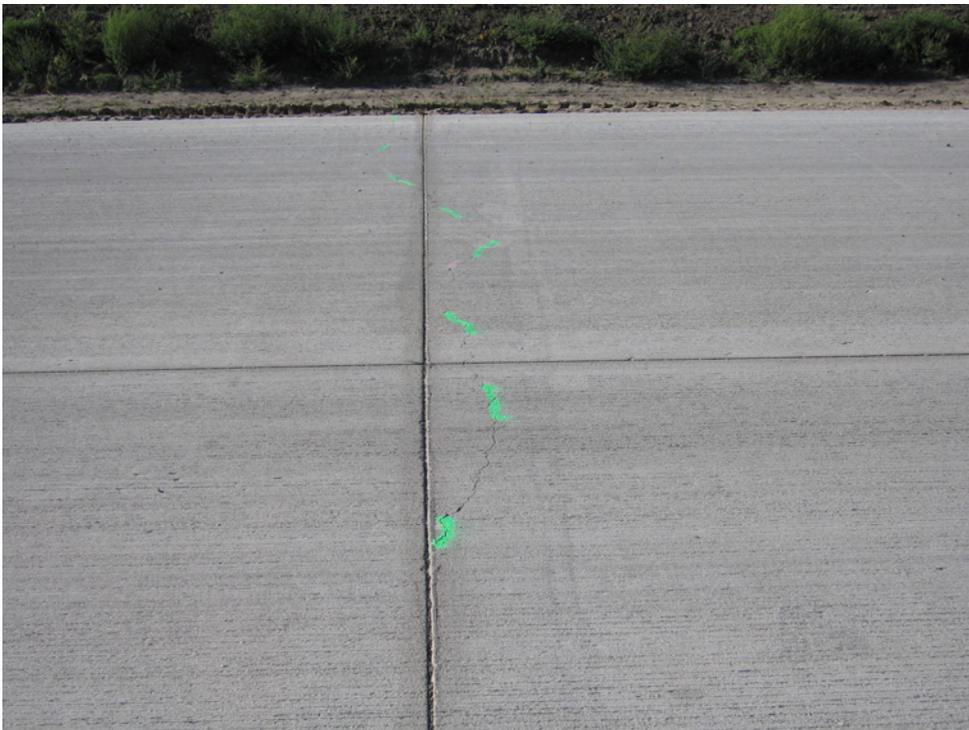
Random Transverse Crack in North Dakota Pavement
